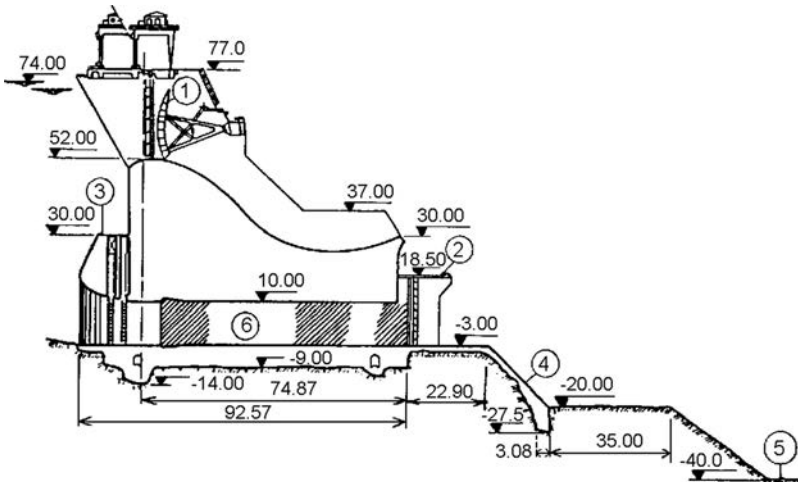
Cross-section through spillway structures of Tucuruí Dam (Rios & Barbalho, 1988). (1) Radial gate; (2) bridge (downstream); (3) bridge (upstream); (4) slab; (5) stilling basin; (6) gallery.
